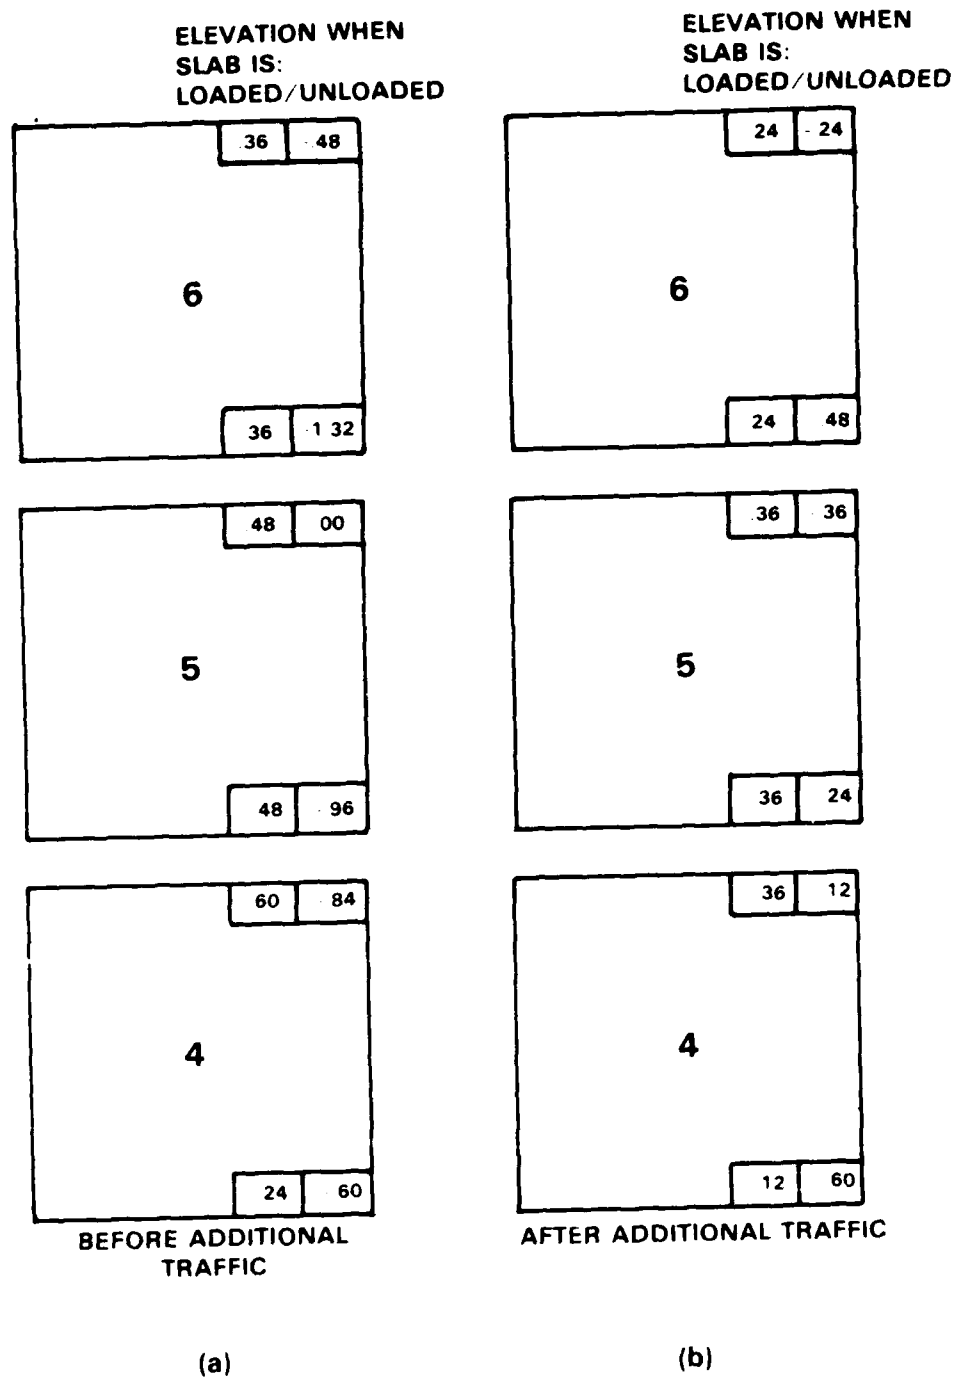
Slab Corner Elevations Under Static Load, Test 4.
